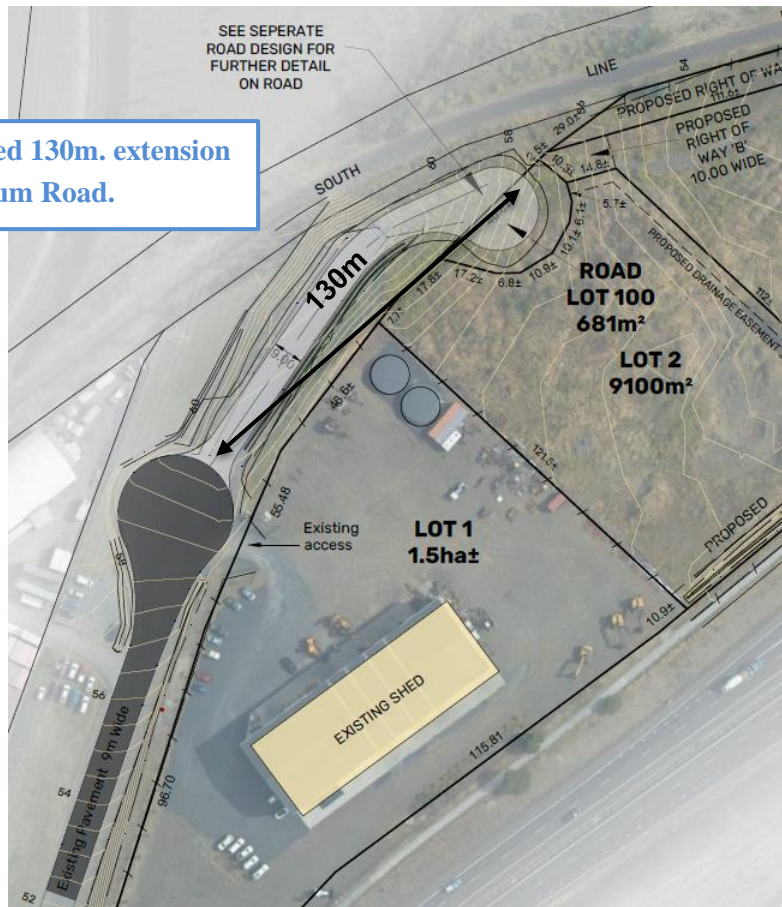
Proposed subdivision layout at 80 Possum Road, Bridgewater
